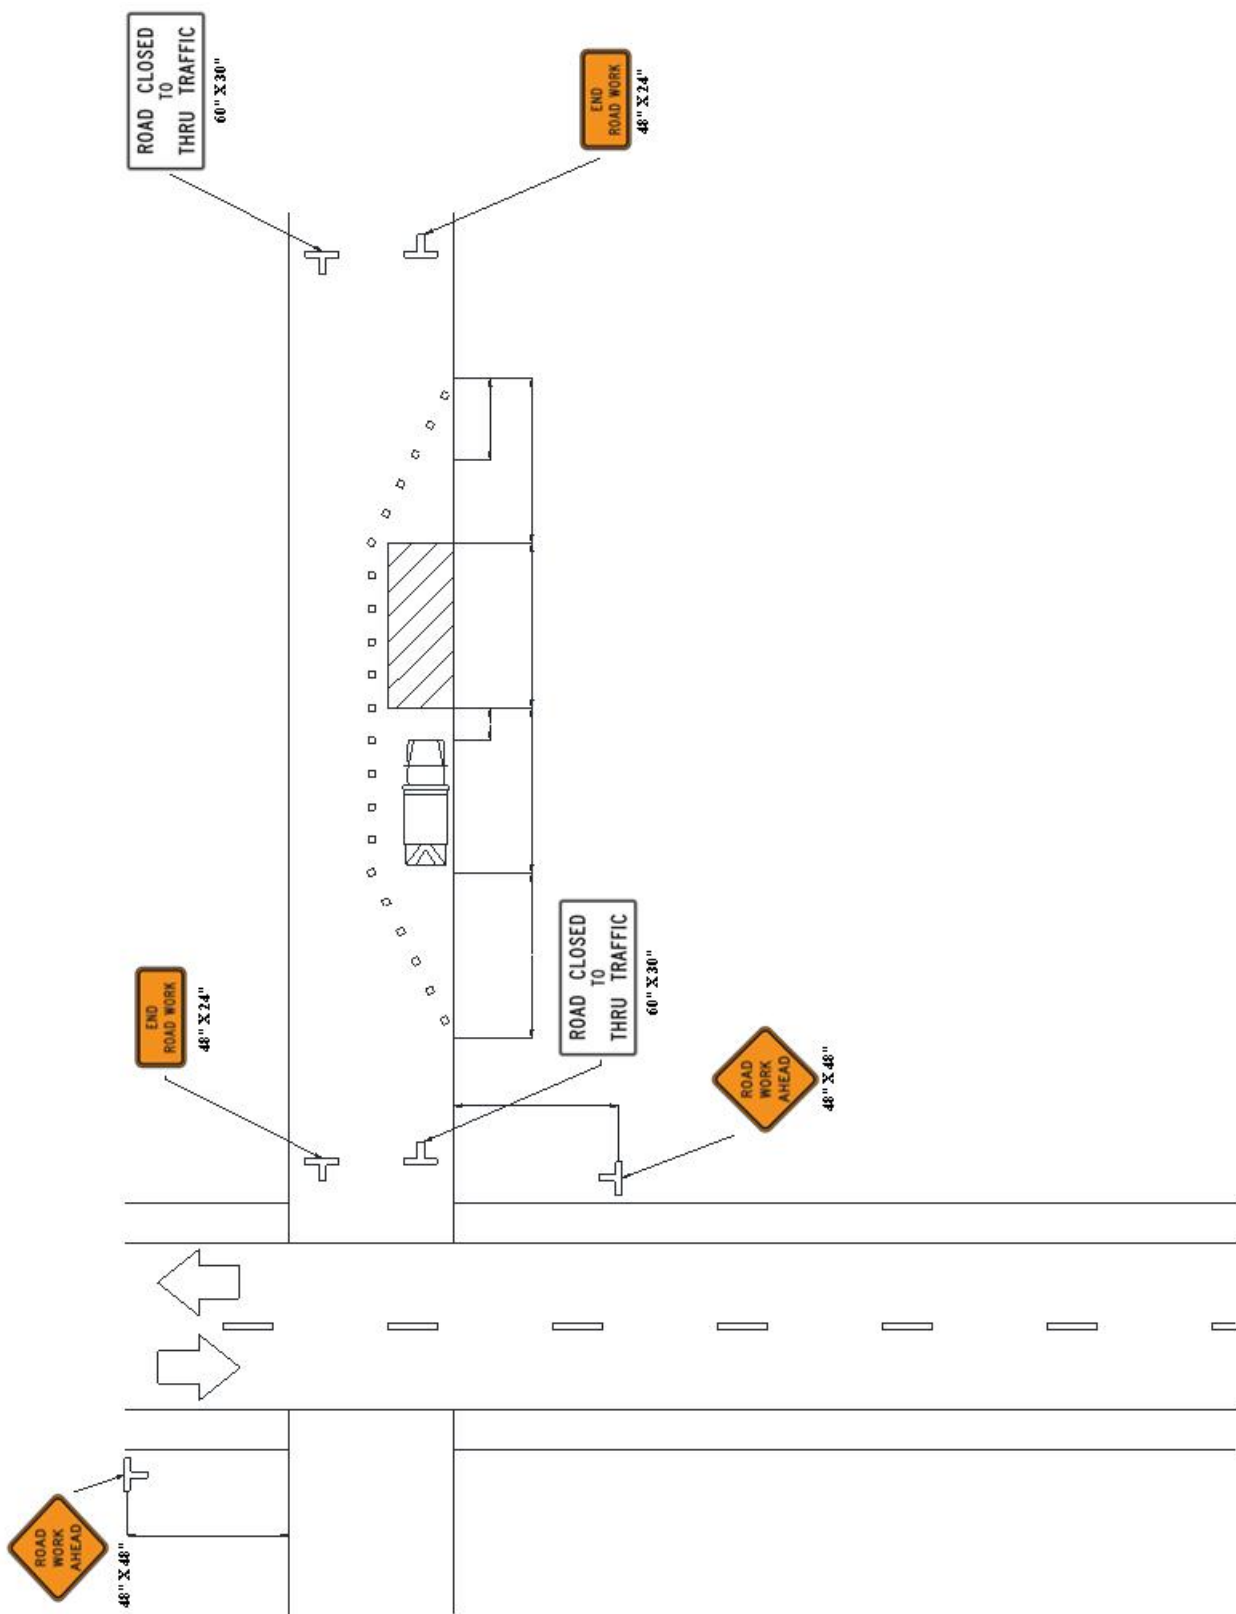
Traffic Control Plan 5 (Station 82+00 to station 86+00)
